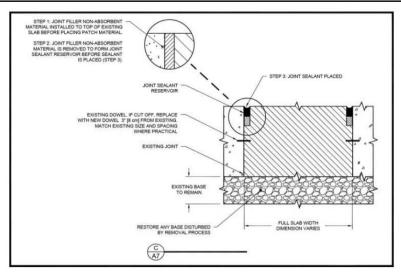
Full depth repair in rigid pavement - full slab replacement
